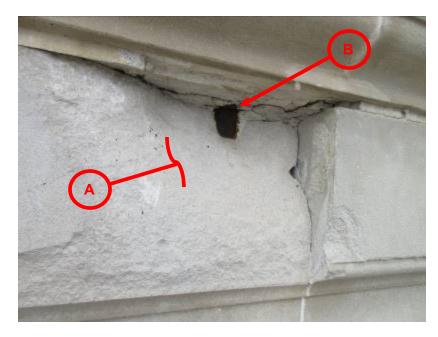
Fairly large, loose spall removed directly below 4th floor wash coursing, L – M Façade, west elevation.
